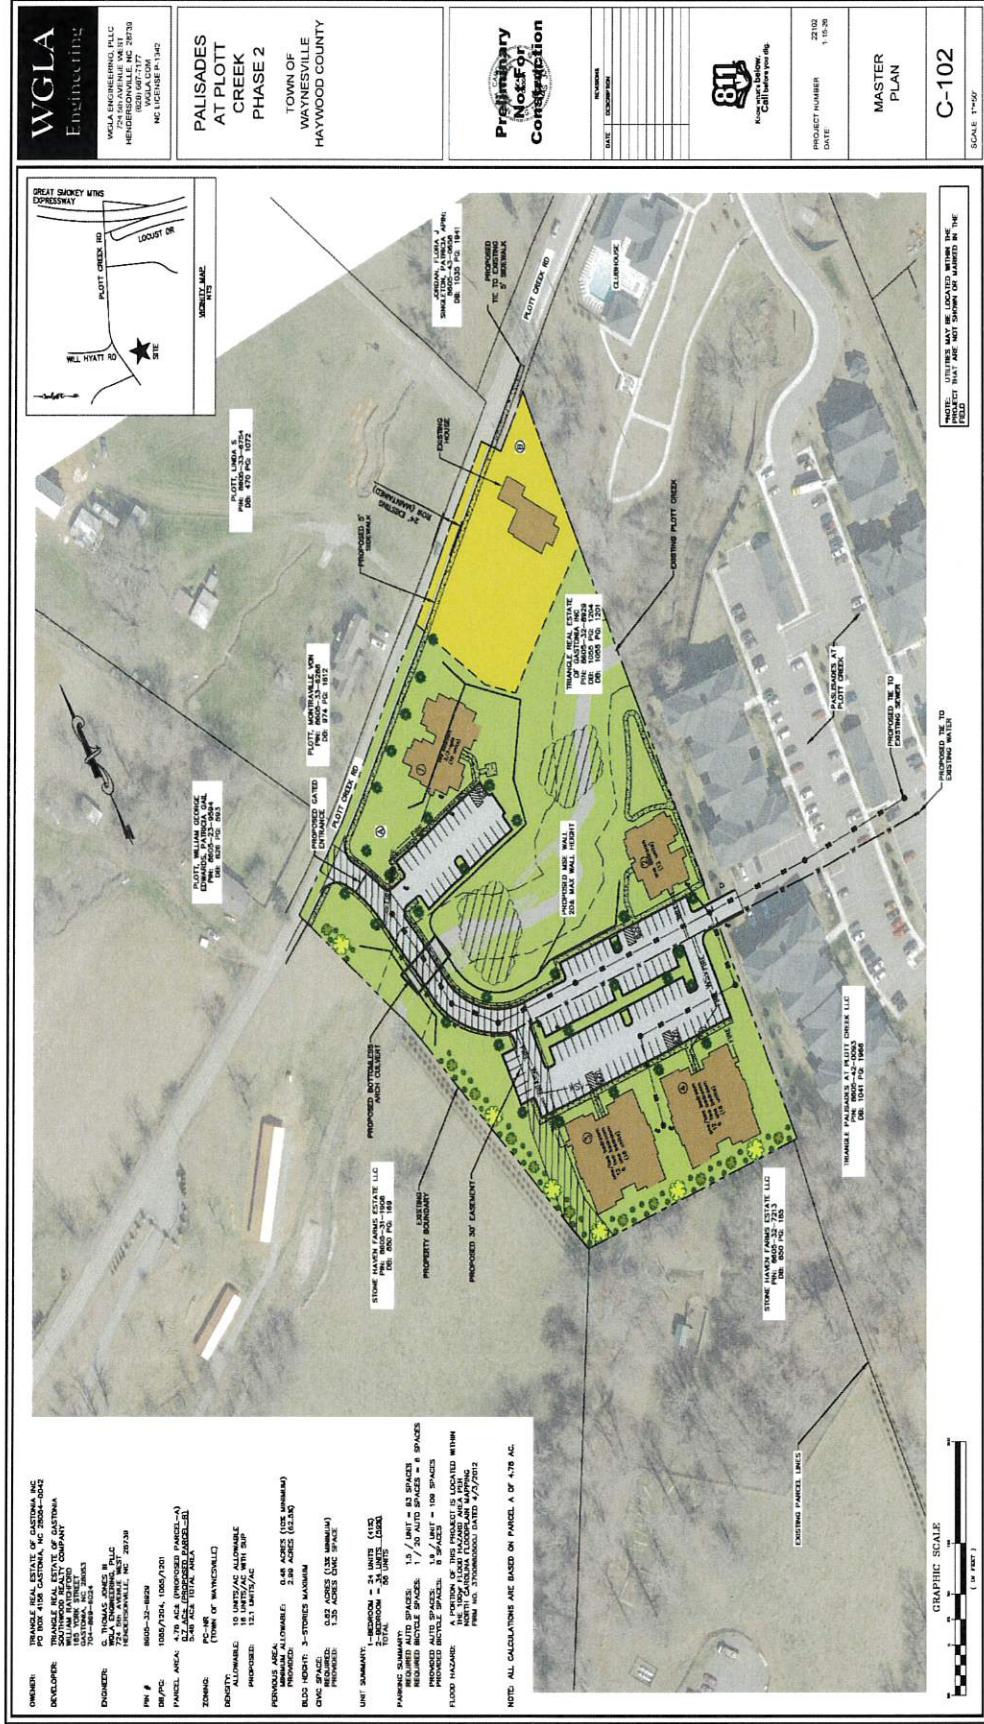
Site Plan – Palisades at Plott Creek (Source: WGLA)
